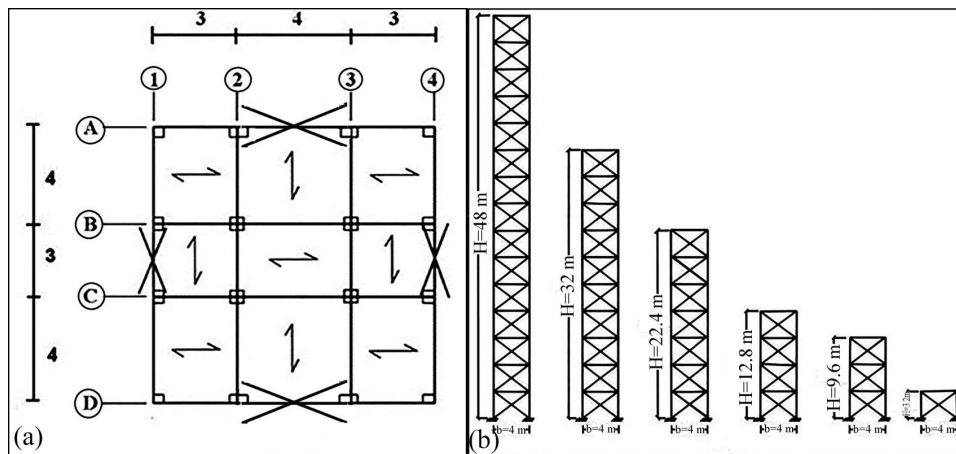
a) Plan of buildings, b) studied X-braced frames
